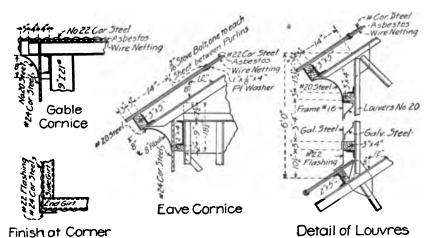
CORRUGATED STEEL LIST AND DETAILS FOR TRANSFORMER BUILDING.
